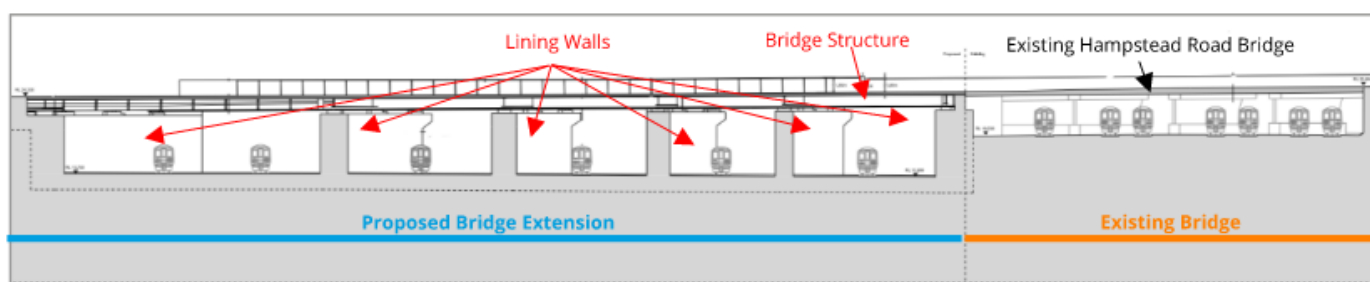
Long section looking north (extract from drawing 1MC03-SCJ_SDH-AR-DSE-SS01_SL12-010021). Elements for Schedule 17 approval under this submission are labelled in Red.
